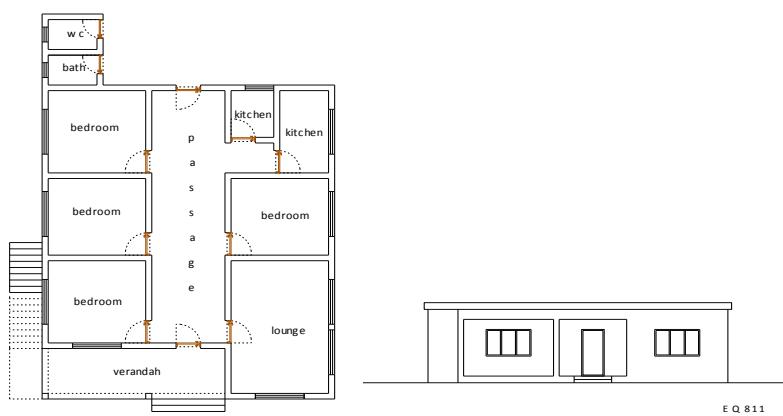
Rooming-House with stairs and concrete roof/floor slab in expectation of another level of rooms (Source: Authors).
